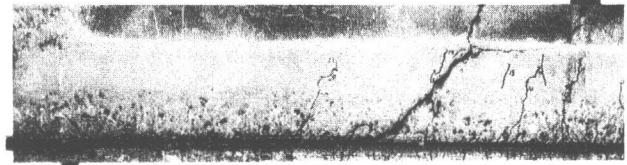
Pattern of internal cracks at anchorage zone of tension bar.
